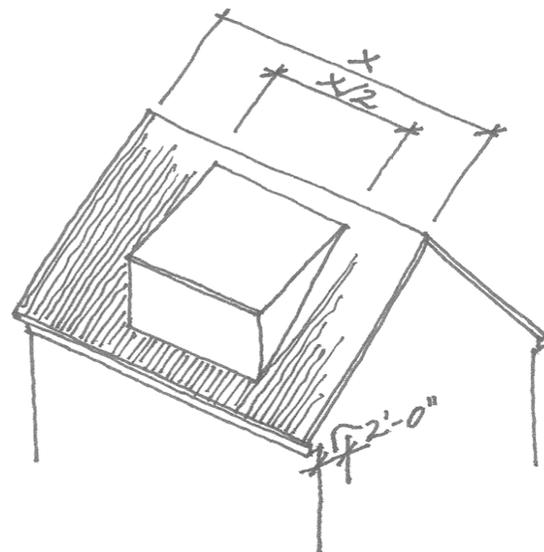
The overall width of a proposed shed dormer should not exceed one-half of the roof width.
